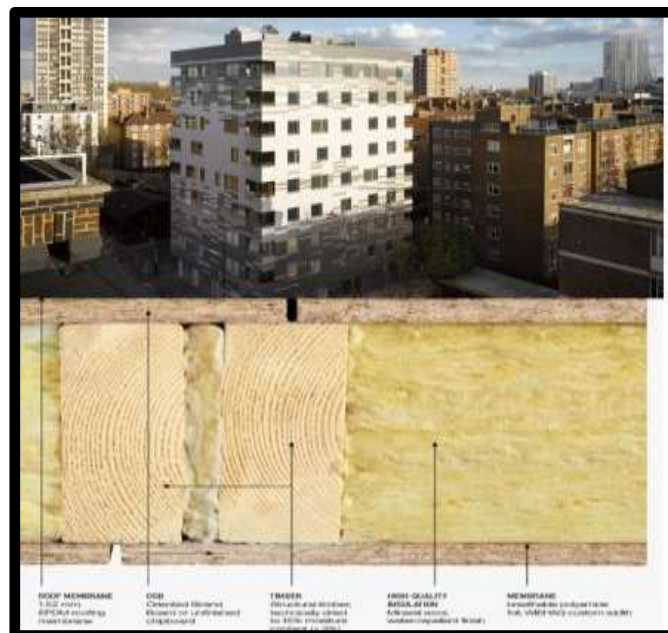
Murray Grove Tower and its employment of pre-fabricated timber panel
